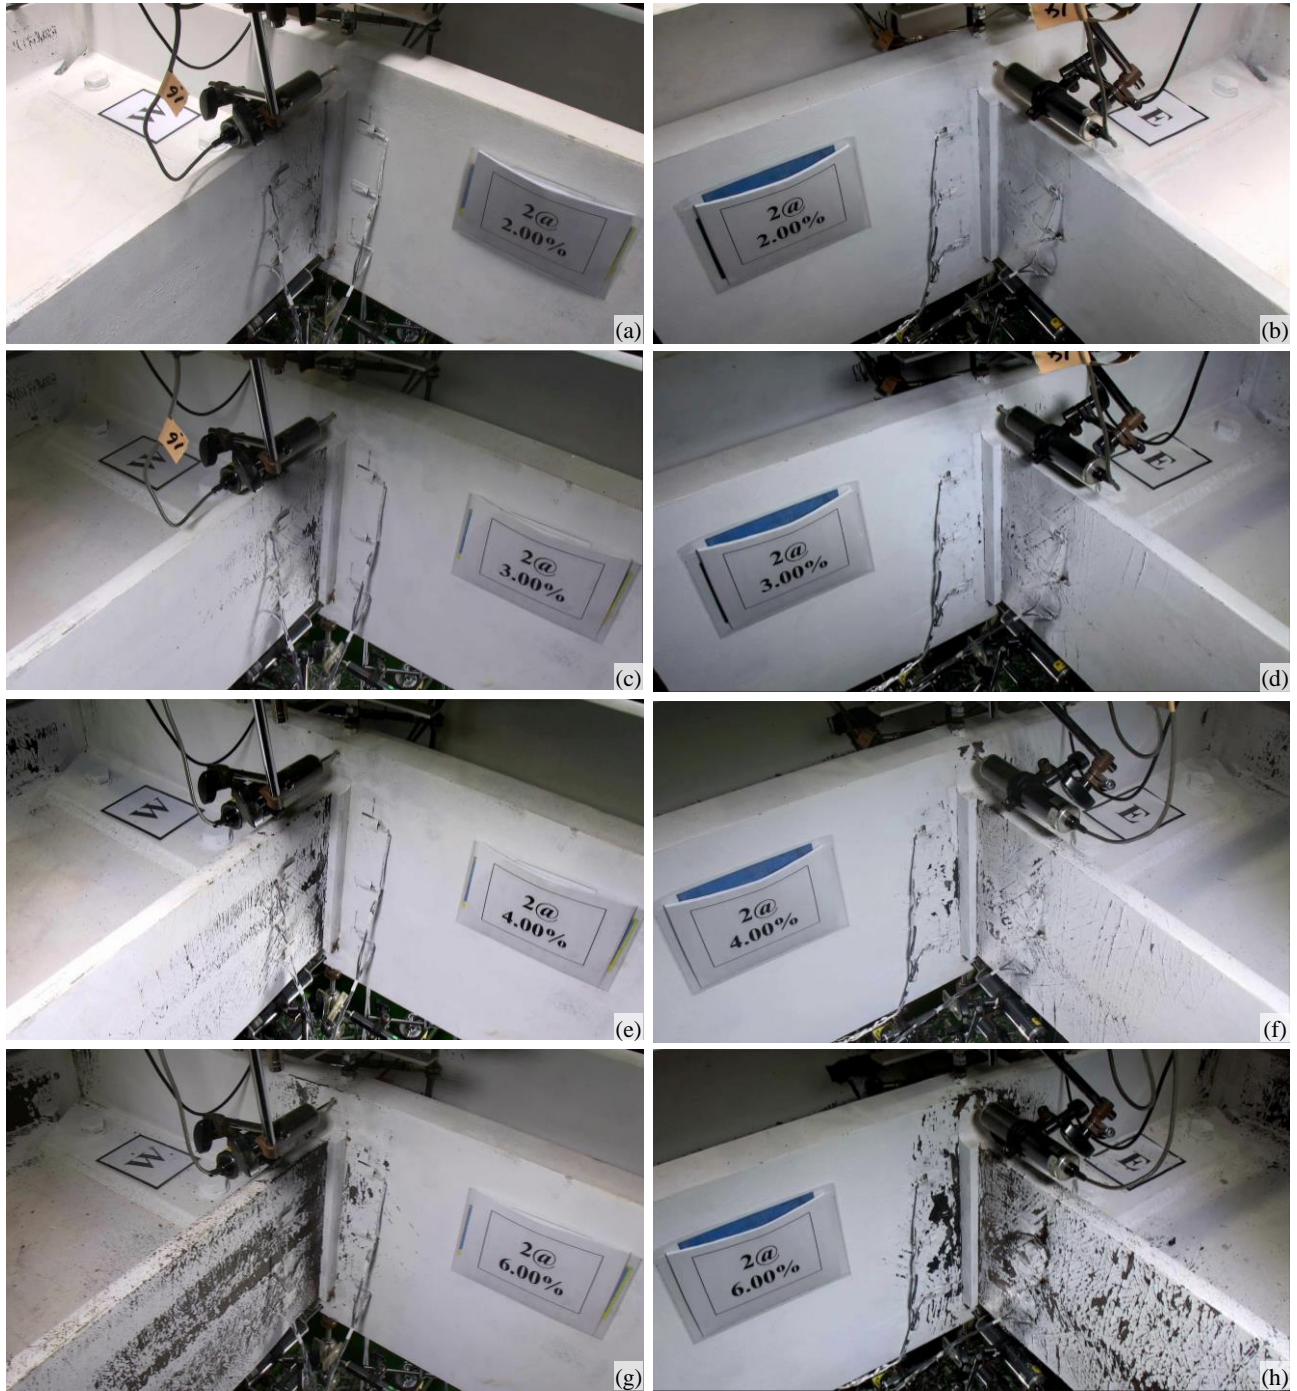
Specimen 1 bottom beam flanges at characteristic loading excursions (left: west beam, right: east beam).
